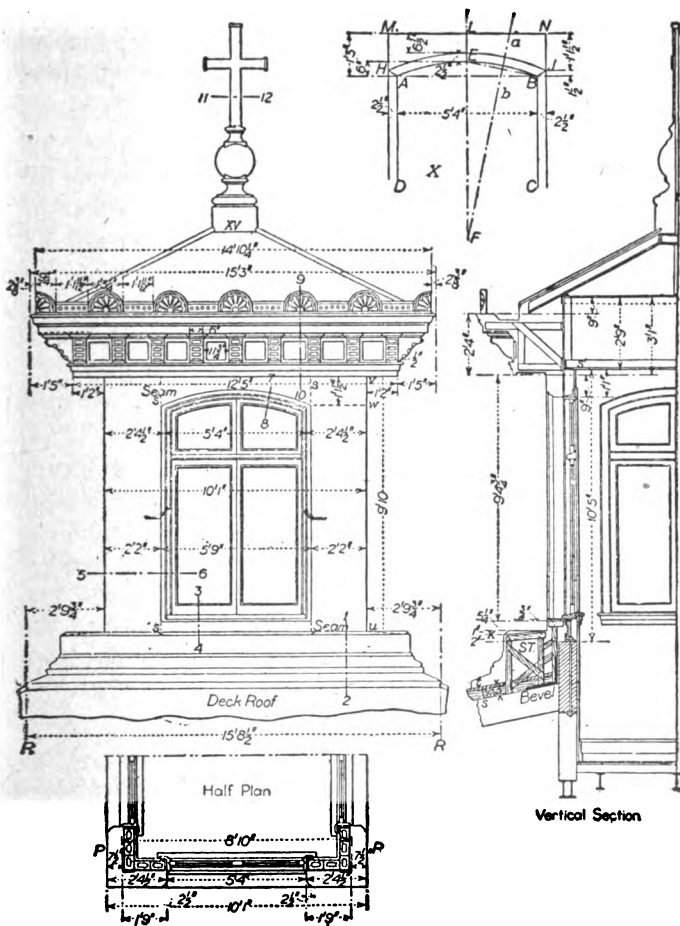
Half Plan, Elevation and Vertical Section with Measurements for Copper Work
